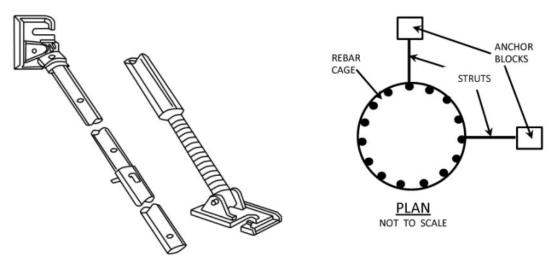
(Left) Adjustable pole brace. (Right)Typical external bracing of rebar column cage using struts and anchor blocks
